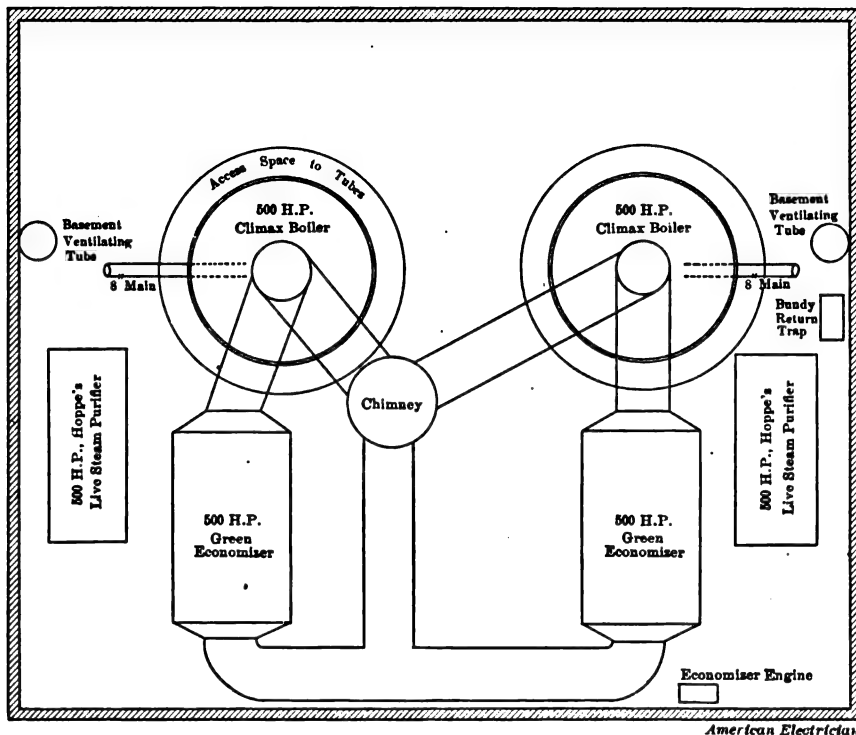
PLAN OF SECOND FLOOR OF BOILER ROOM.
